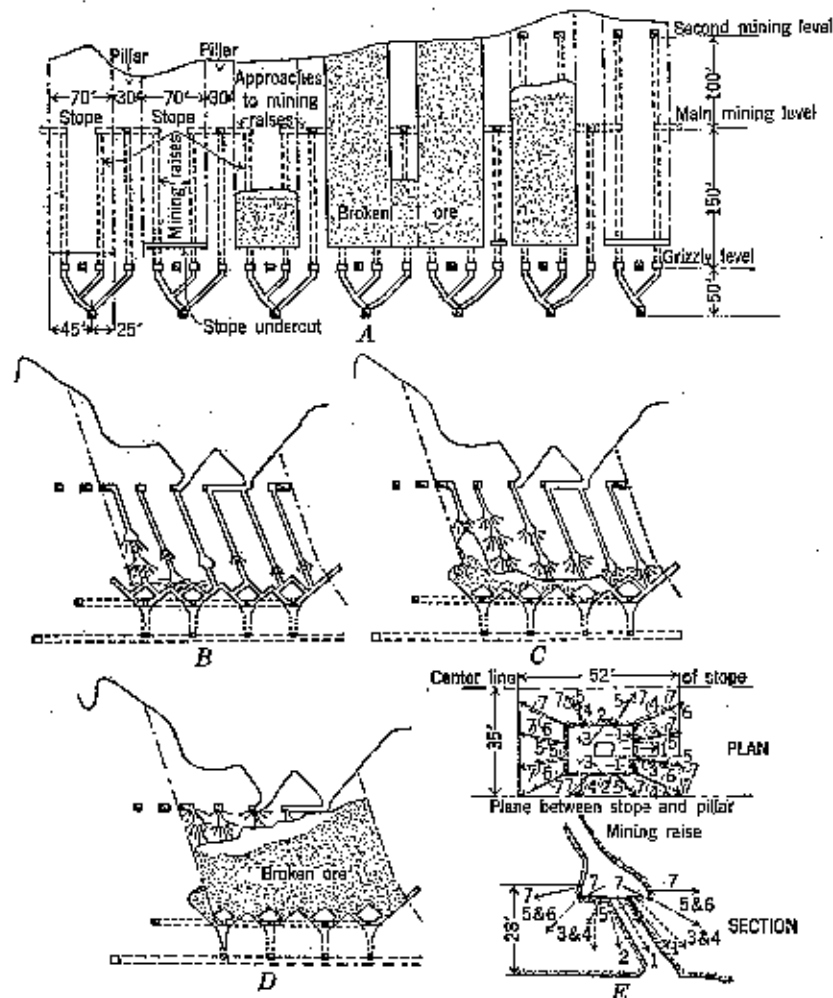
Mining system employed at Beaton mine, Labrador, Alaska: A, Ideal vertical section parallel to strike showing levels, branch raises, stopes, and pillars; B, section of 202 stope, preparation completed and stope undercut; C, section of 202 stope after 2 months mining; D, same stope after 6 months mining; E, plan and section of typical long round in raise bench in hard ground.
